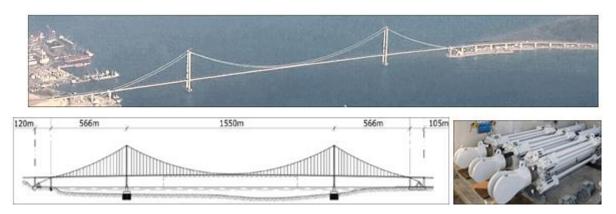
General layout of Osmangazi Suspension Bridge and the viscous dampers used
